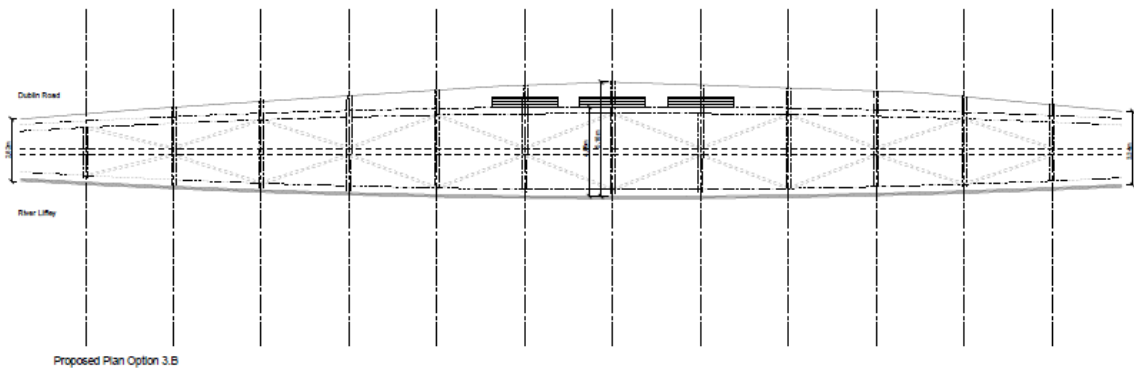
Plan of Proposed Pedestrian and Cycle Bridge
